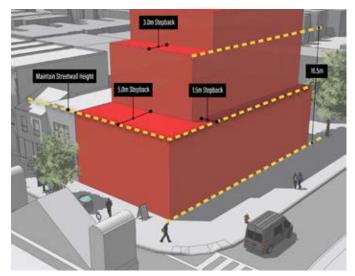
New development and additions to non-contributing corner properties shall provide a minimum stepback of 1.5 metres on their side elevation.
